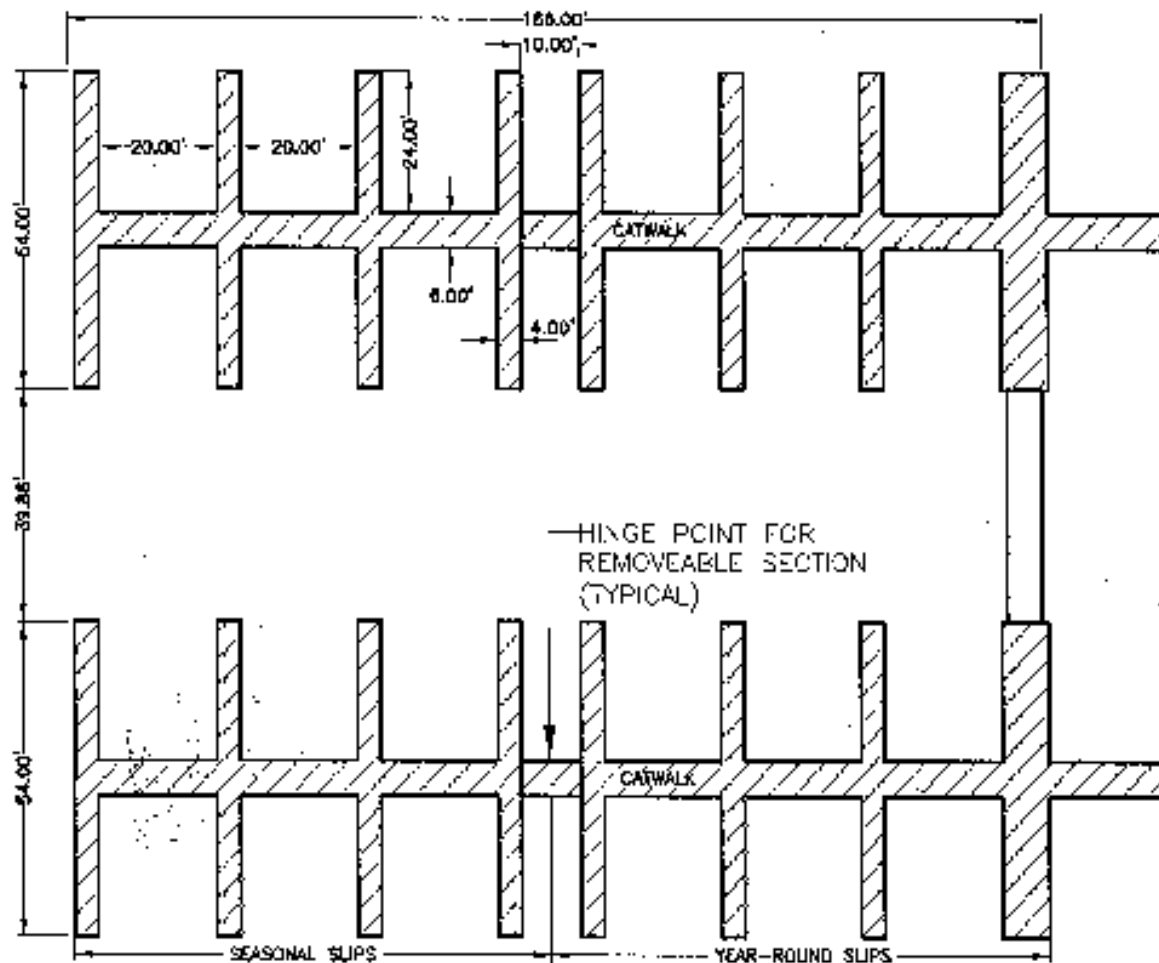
Sunset Bay Proposed Boat Dock Plan - Winter Configuration and Lake Bottom Elevation
